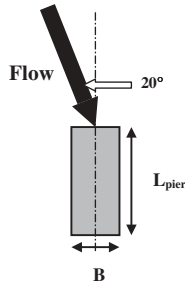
Plan view of single rectangular pier scour case (Example 2).
